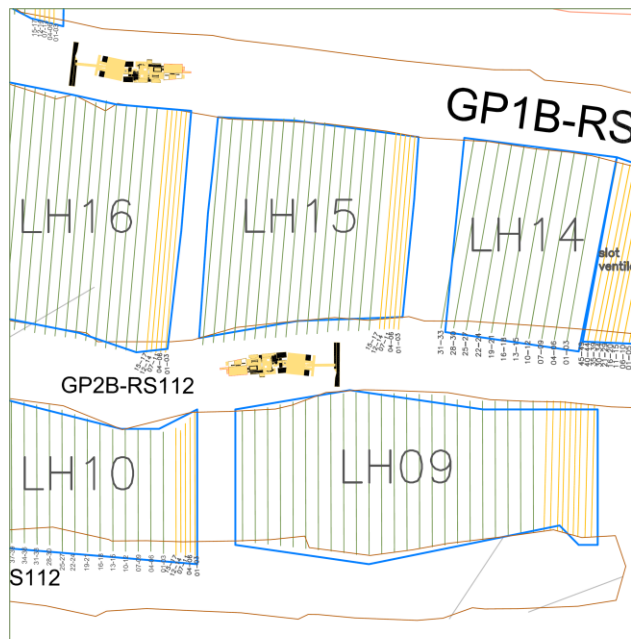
Proposed long hole layout, for scale fan drill length 11 m
